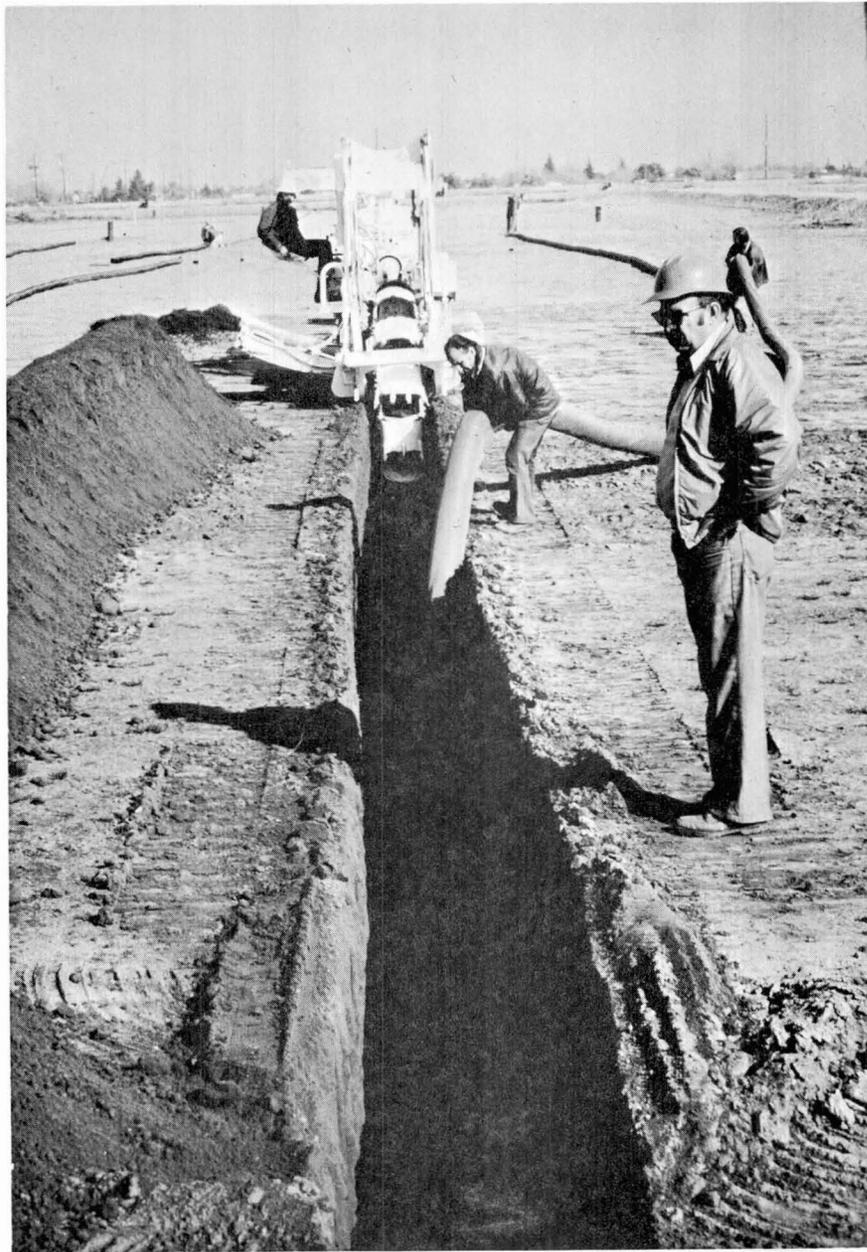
A - INSTALLATION OF COLLECTOR IN TUNJUNGA SOIL
